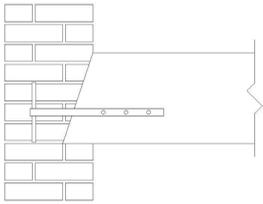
Wood joists pocketed into masonry walls and held with metal anchor
